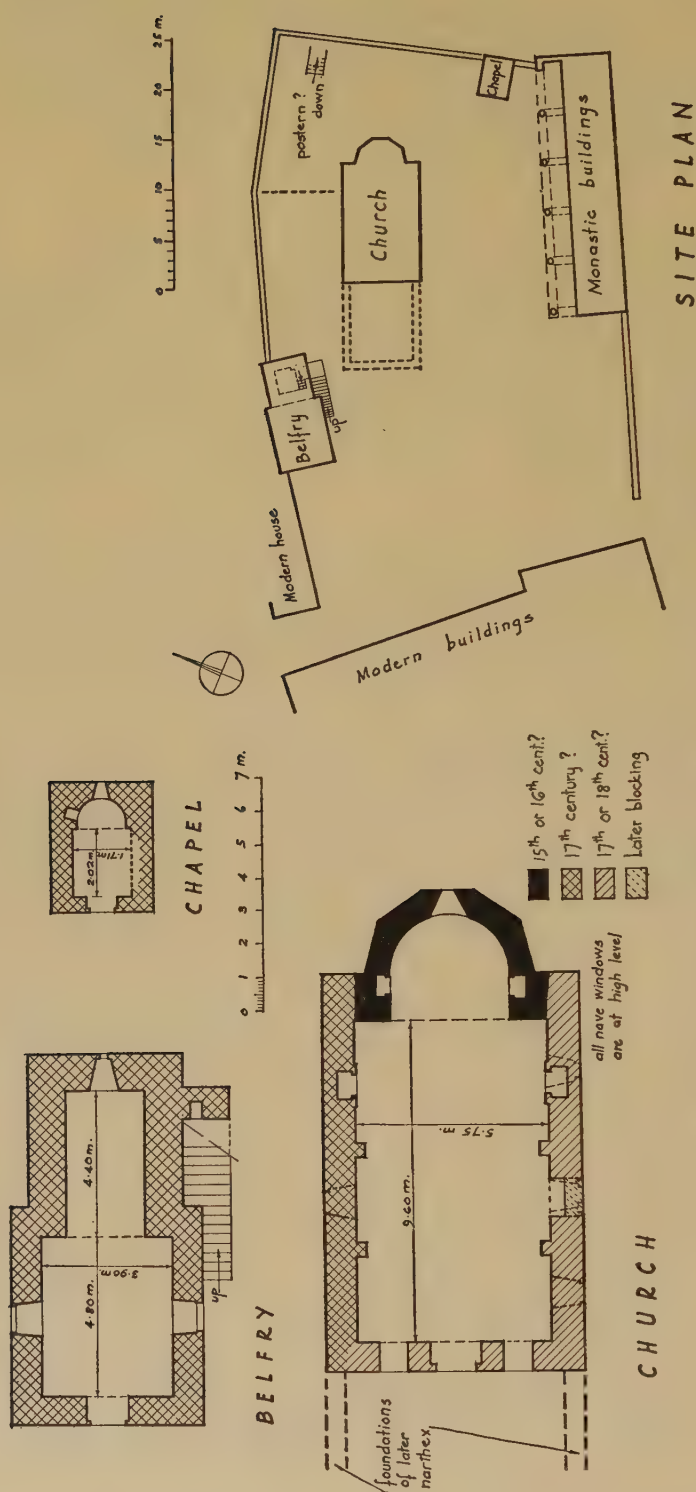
Plan of church, chapel and belfry, and site plan, of Kaymaklı monastery.
